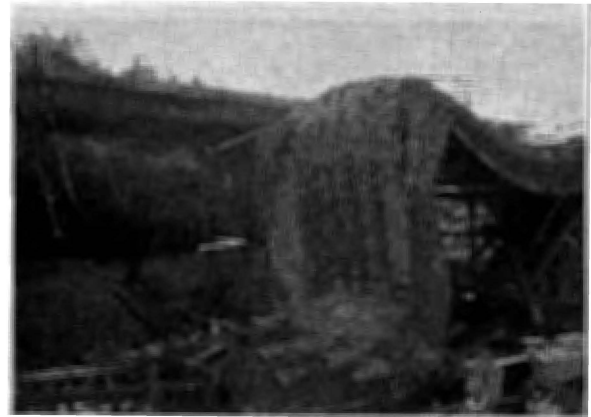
State of the collapsed form shoring at the construction site of Hanshin Highway in Kobe.
